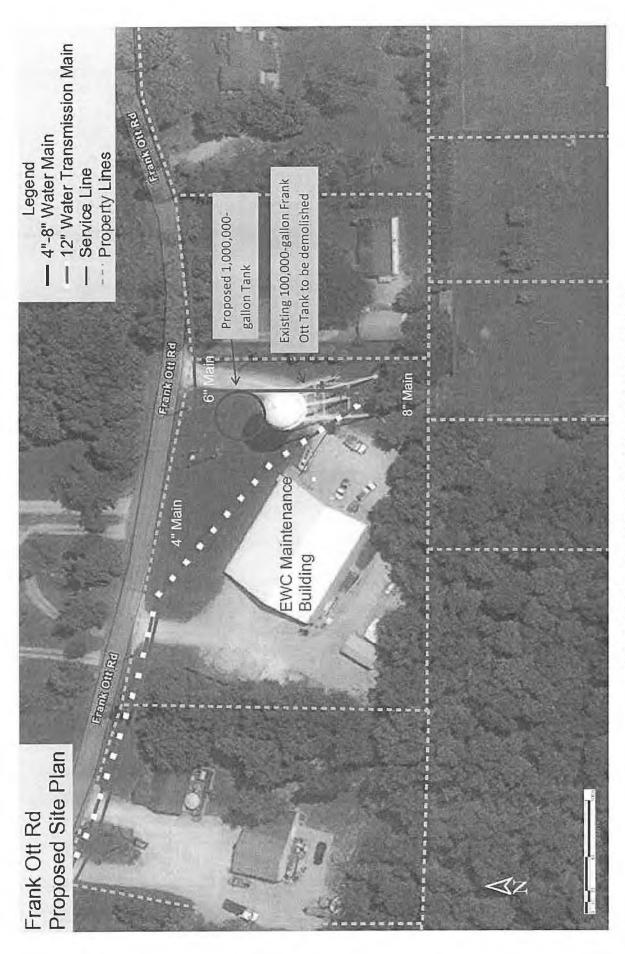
Proposed Site Plan for the Frank Ott Road Tank
